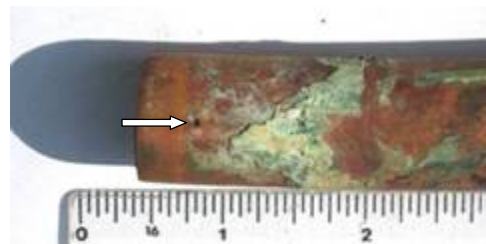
Localized (pitting) corrosion resulting in pinhole leak near a soldered joint
